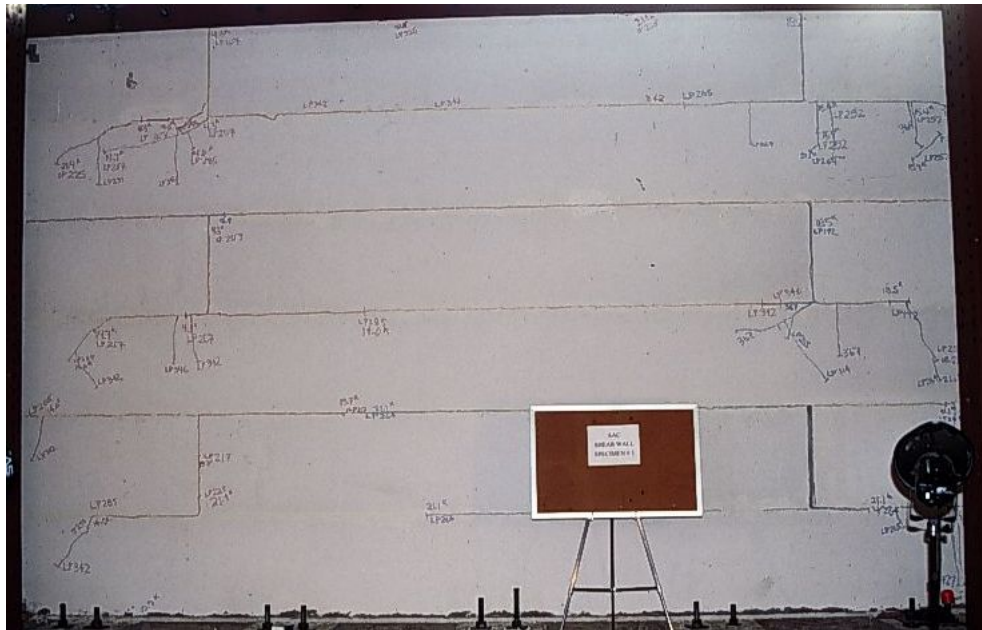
Shear Wall Pilot Specimen 1 at end of test
